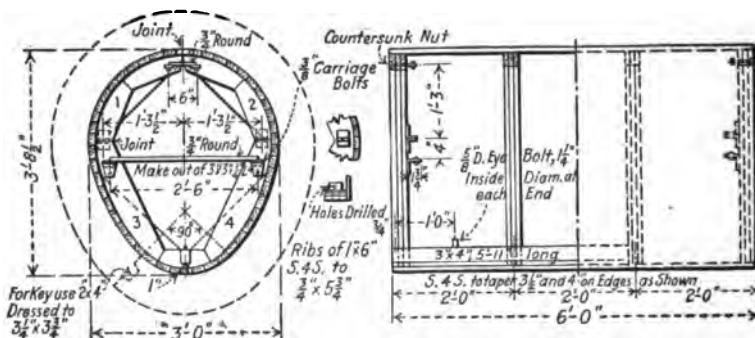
Wooden Forms Used in Tunnel, North Shore Sewer, Sanitary District of Chicago.
